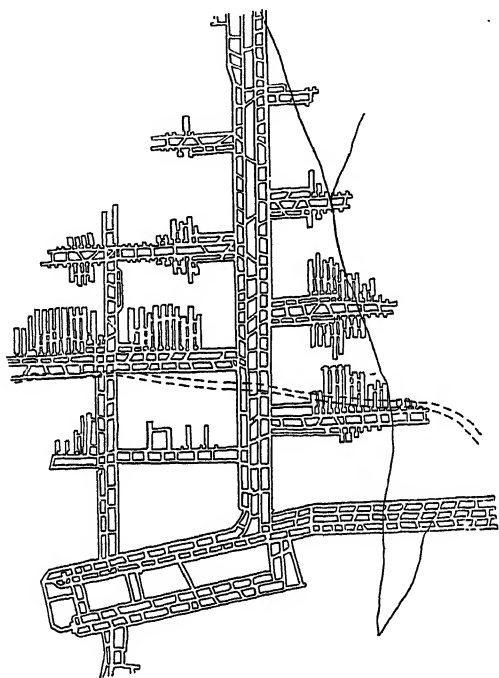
PRESENT PLAN OF MINING IN THE WEST VIRGINIA PANHANDLE.
